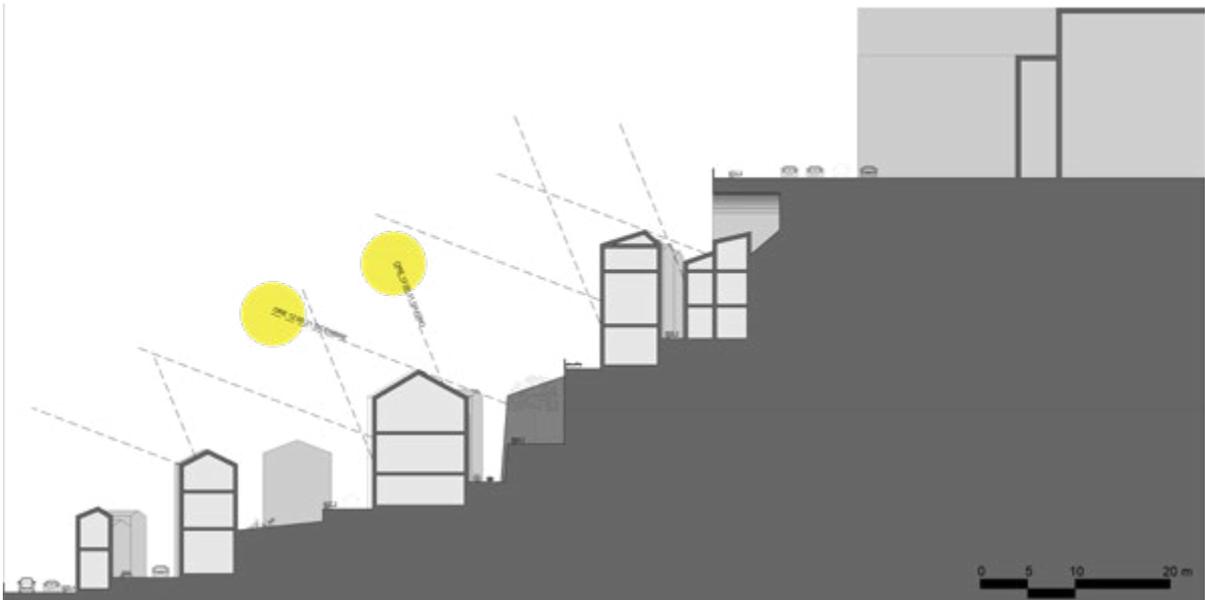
Section of the orientation of typical buildings in the Madonie area ©2023, photo by the author.
